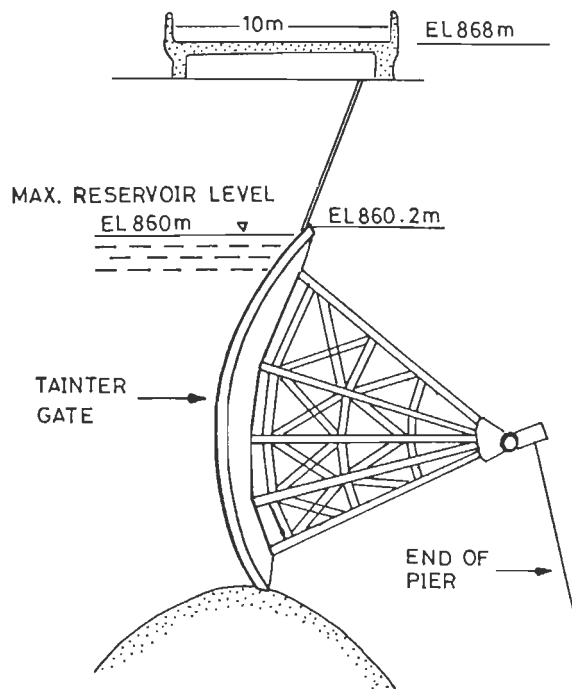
TANTIER GATE OF KISHAU DAM SPILLWAY.
